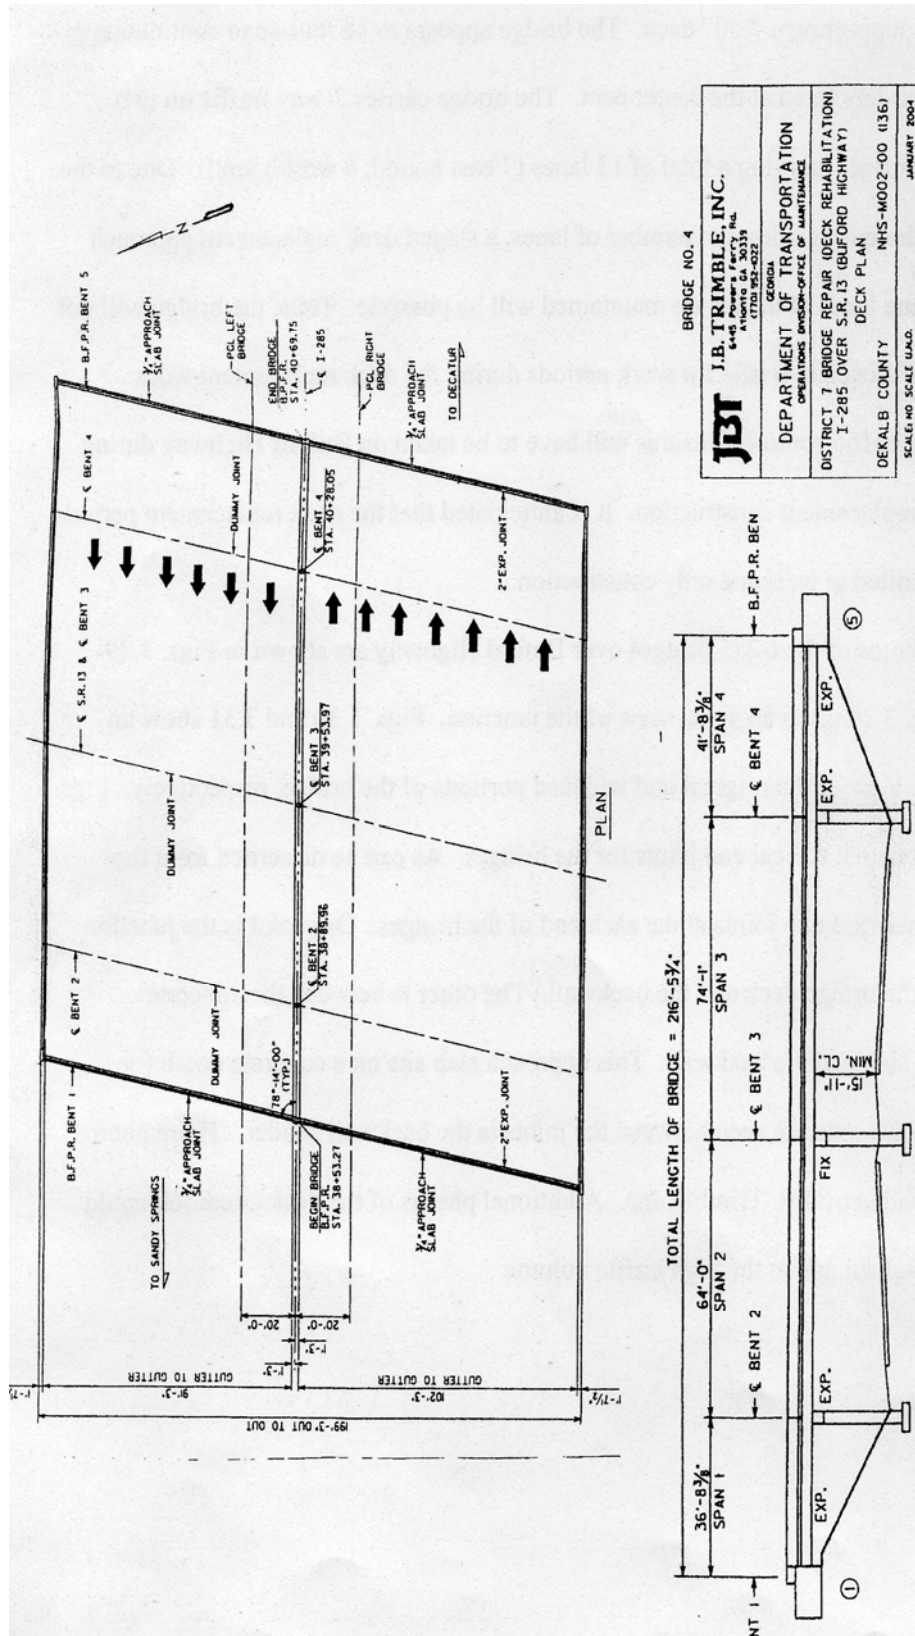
Plan and Elevation of I-285 Bridges Over Buford Highway (2)
